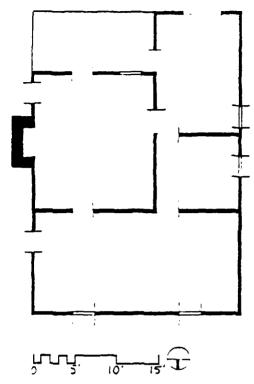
Plan of a frame single pen house enlarged with additions on the front and side. Bay Springs Tract 400-2, 4½ miles southwest of Tishomingo, Tishomingo County, Mississippi. HABS plan.
